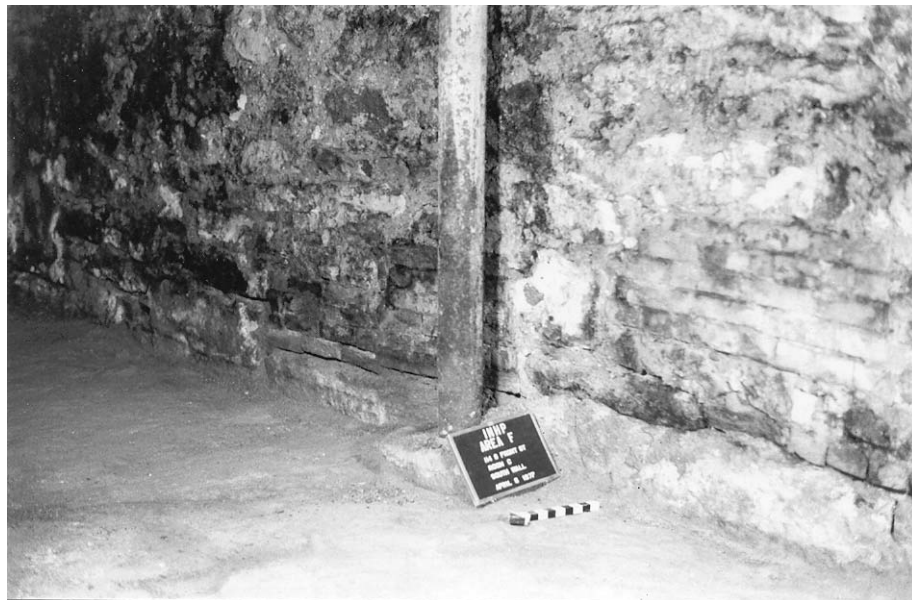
Area F, 114 S. Front Street, Room C, south wall. Note area of brick in stone wall to the right of pillar.
